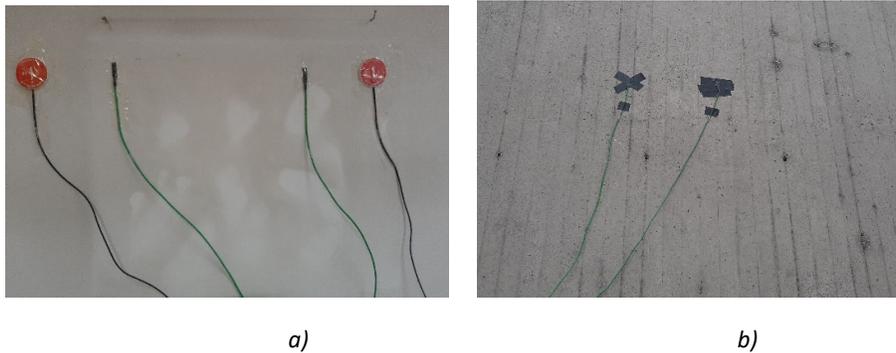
In situ measurements sensor positions on the facade wall a) inside b) outside
